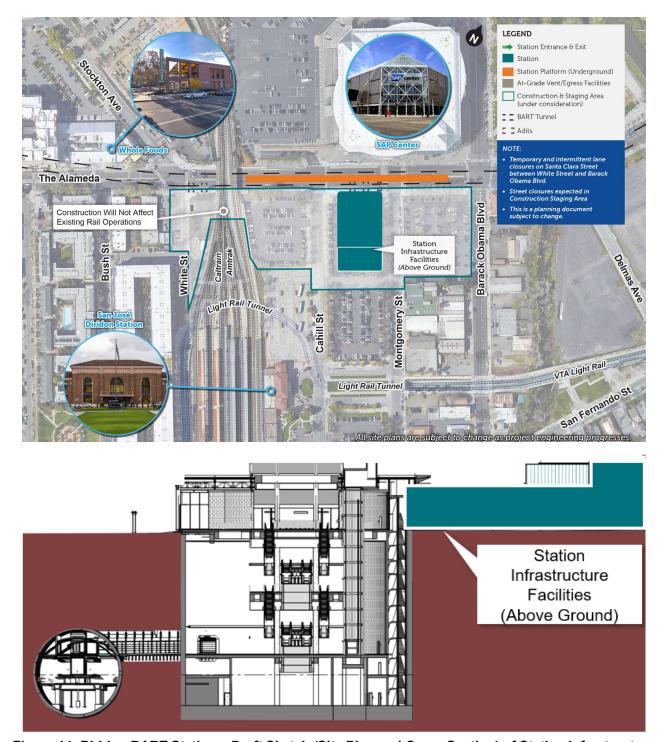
Diridon BART Station – Draft Sketch (Site Plan and Cross Section) of Station Infrastructure
